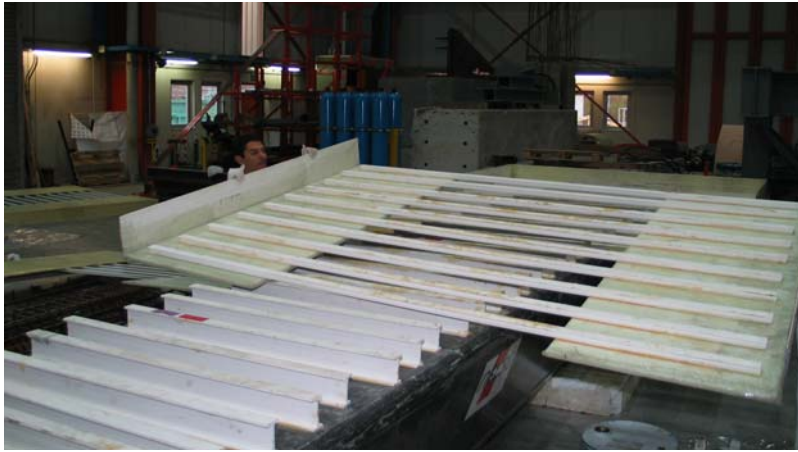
Detail of GFRP slab formwork slotted between the main shear-lock pultrusion beams
